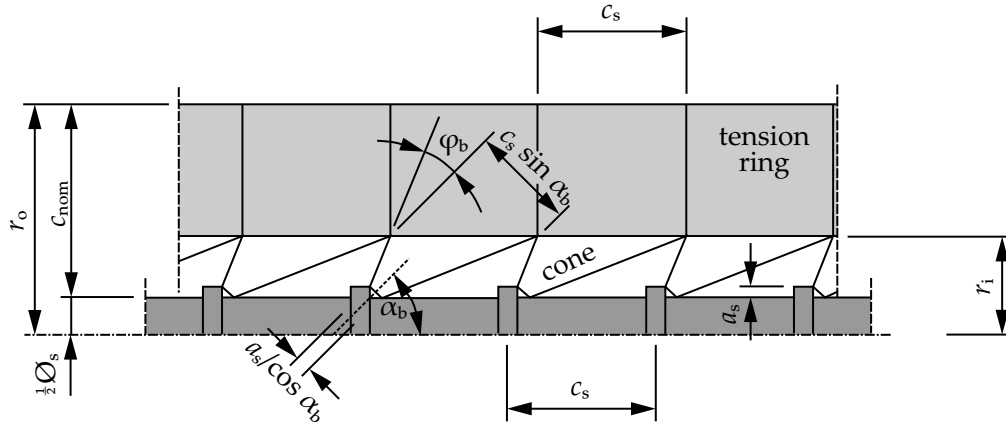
Tension ring around reinforcement bar, adapted from [162]
